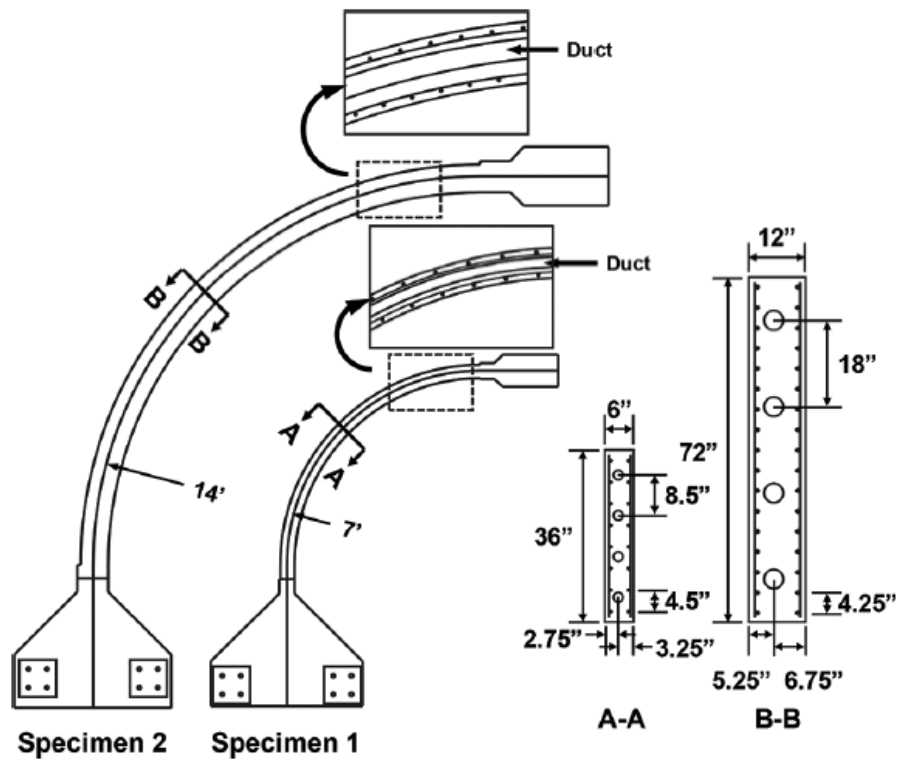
Summary of dimensions and reinforcement details. Duct numbering starts from the top duct (e.g., Duct 1 is the top duct). (Choi, Woods, Hrynyk, & Bayrak, 2017)
